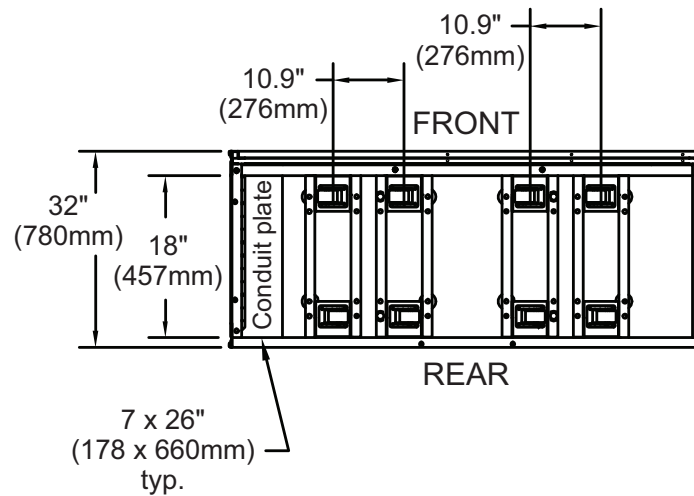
Footprint and floor cutout dimensions for Transformer Section - 800kVA units
